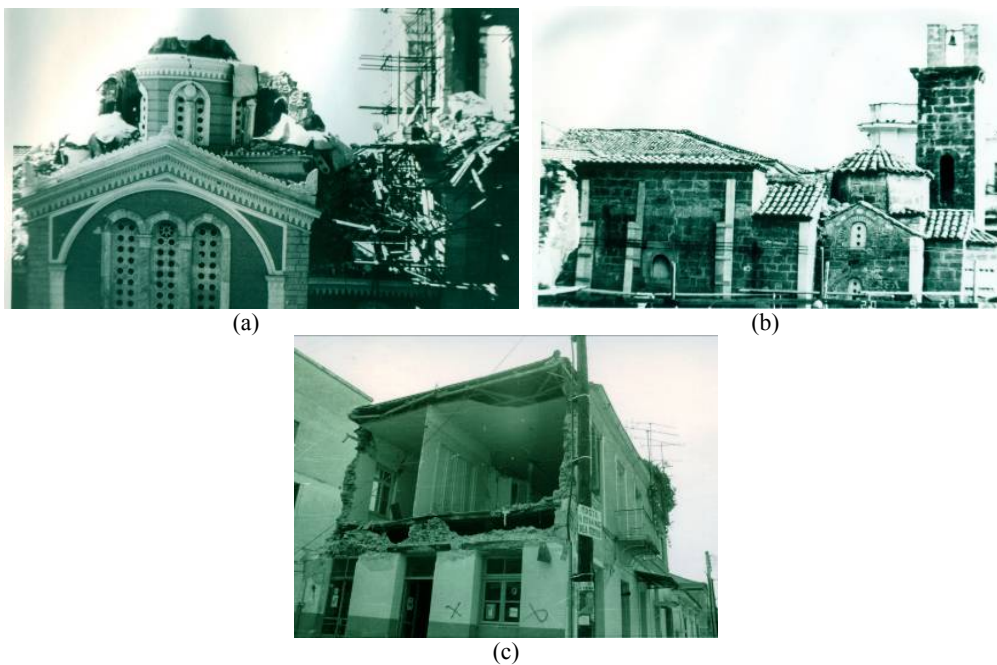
(a) Collapsed church at the city center; (b) Collapsed old cathedral church at the city center; (c) Collapsed 2nd story of old masonry house.
